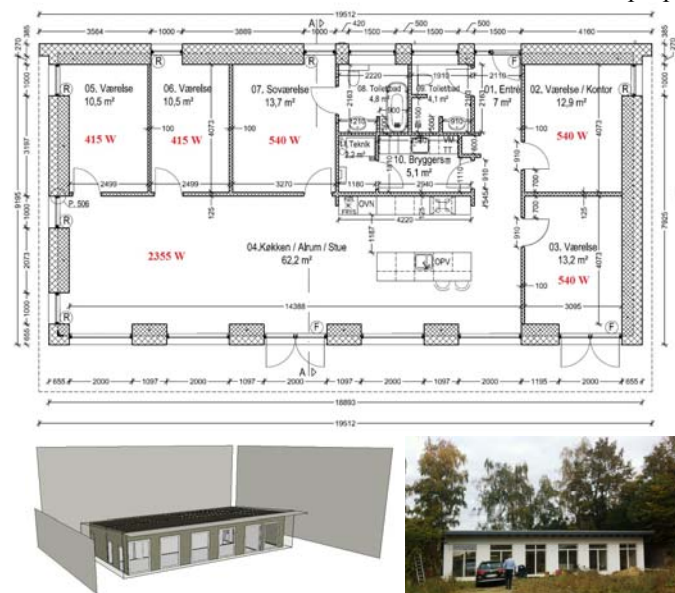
Top: Floor plan of the test house (www.passivbolig.dk). Bottom left: IDA ICE model of the test house. Bottom right: Foto of the actual house in Frederikssund, Denmark.
